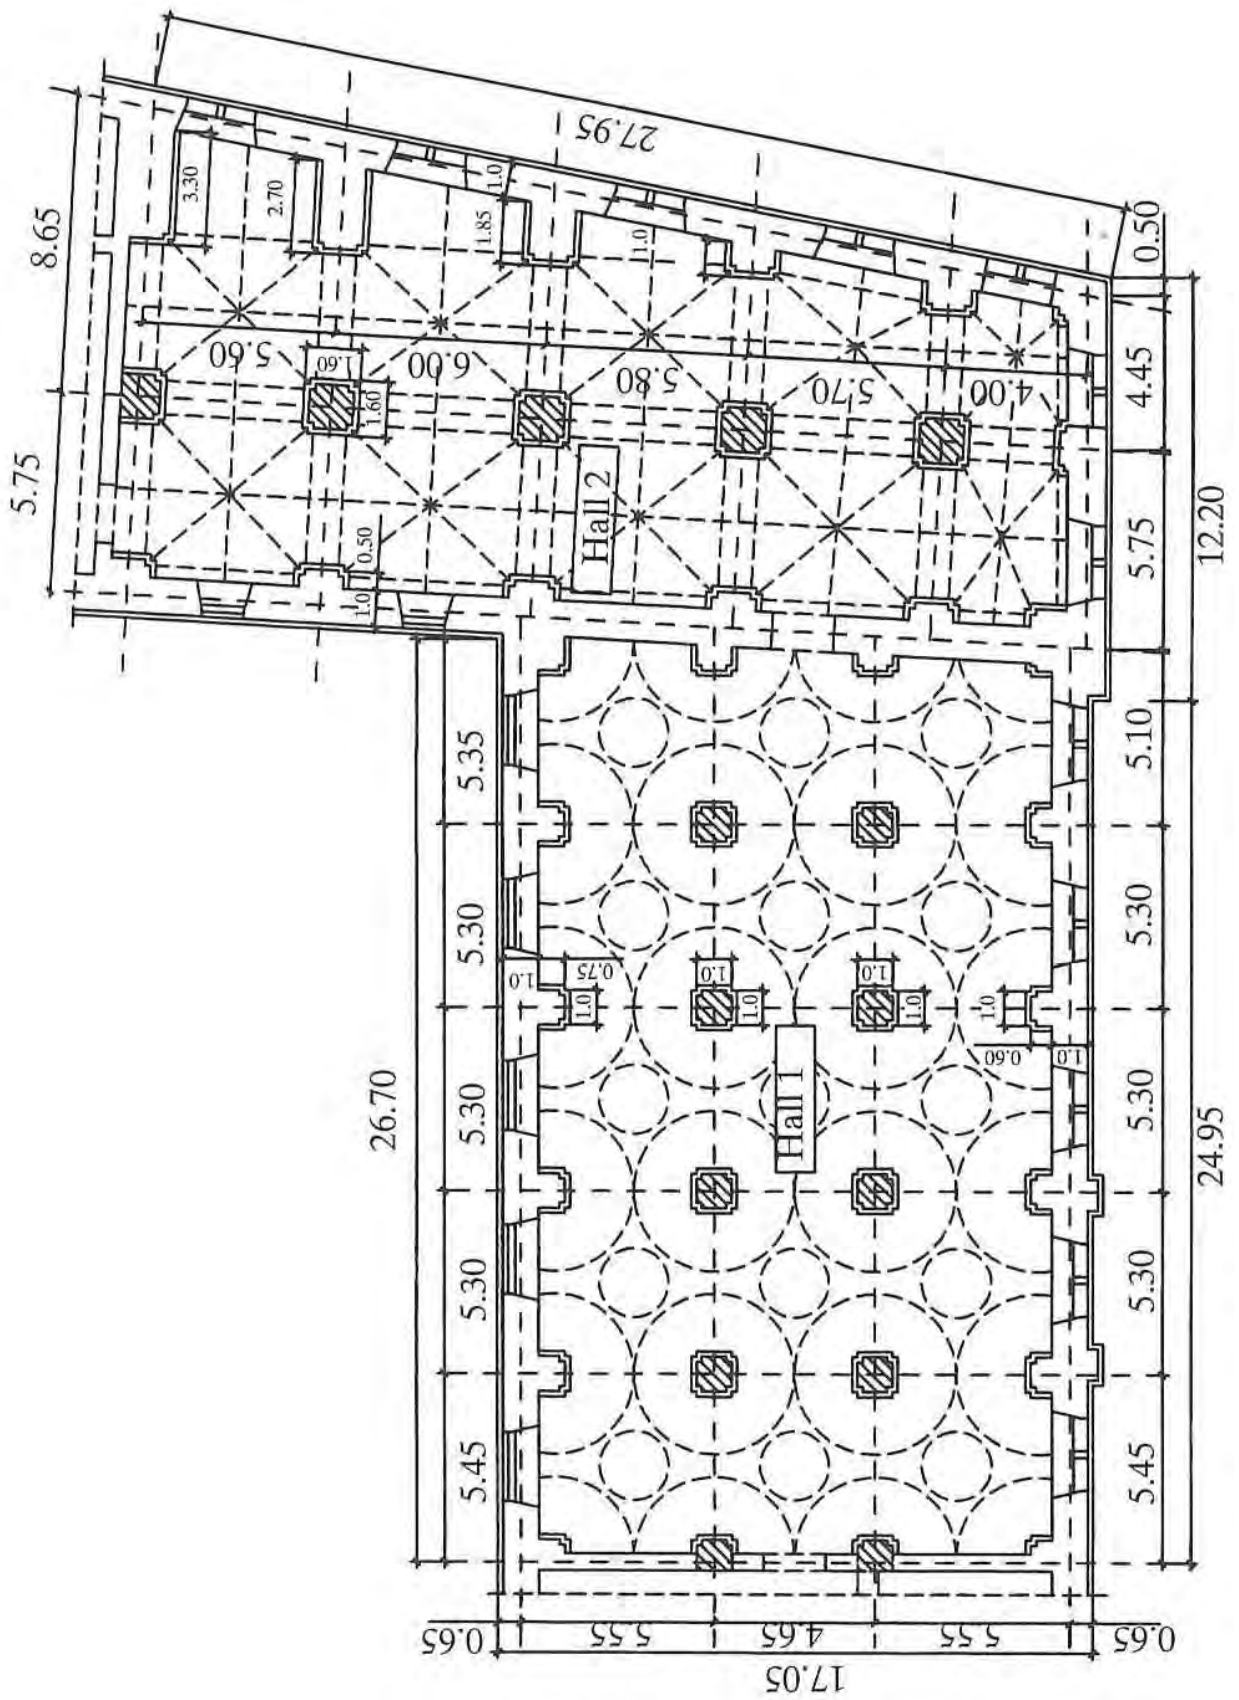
Horizontal section at second story through Hall 1 and Hall 2
